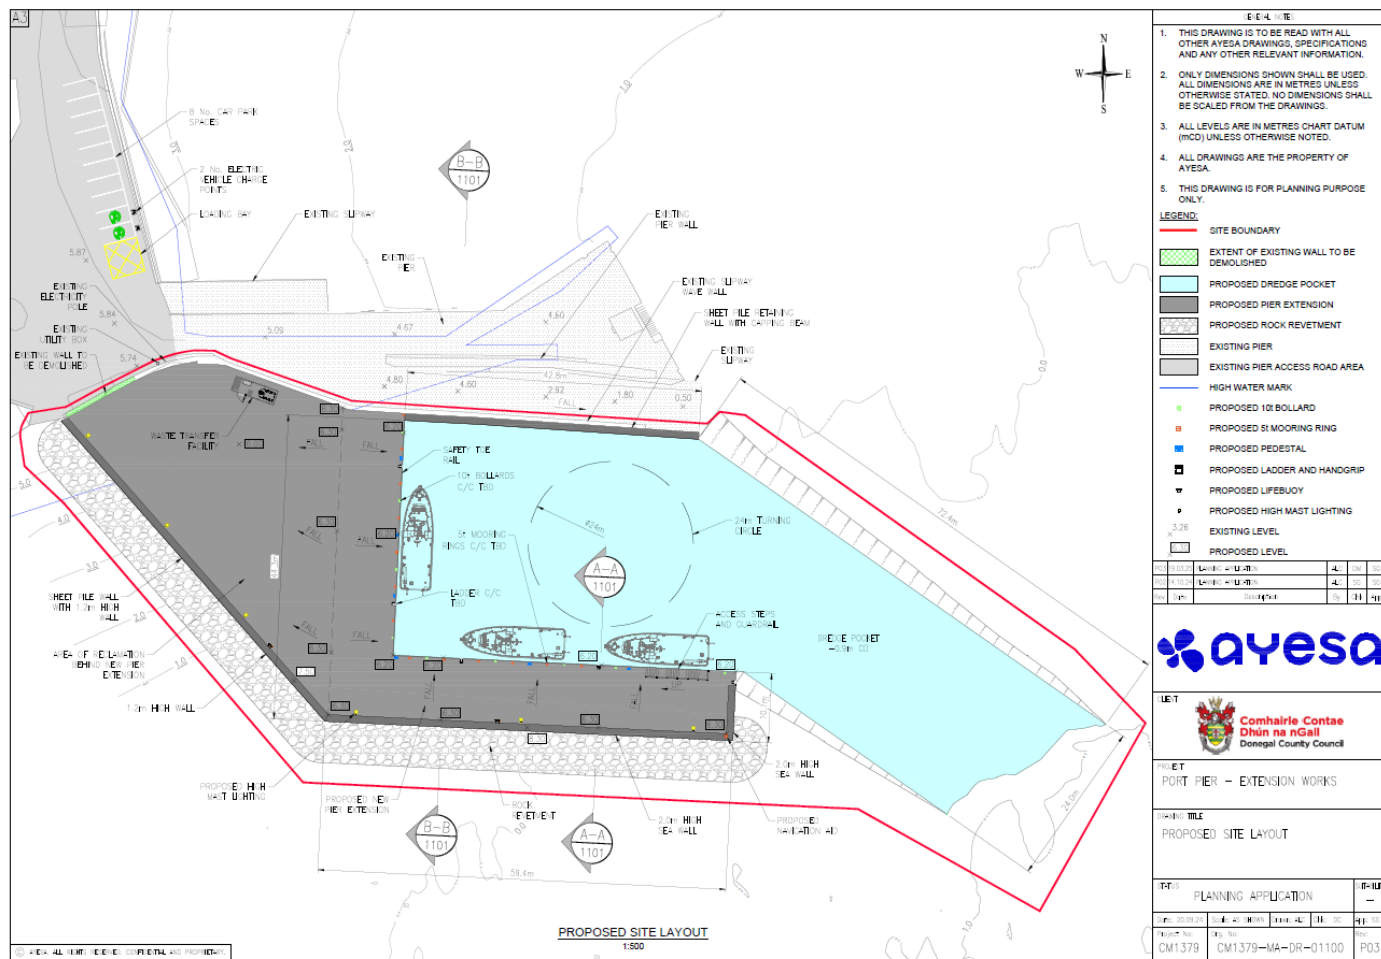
Proposed extension layout and dredging pocket, as supplied by Ayessa Ltd..
